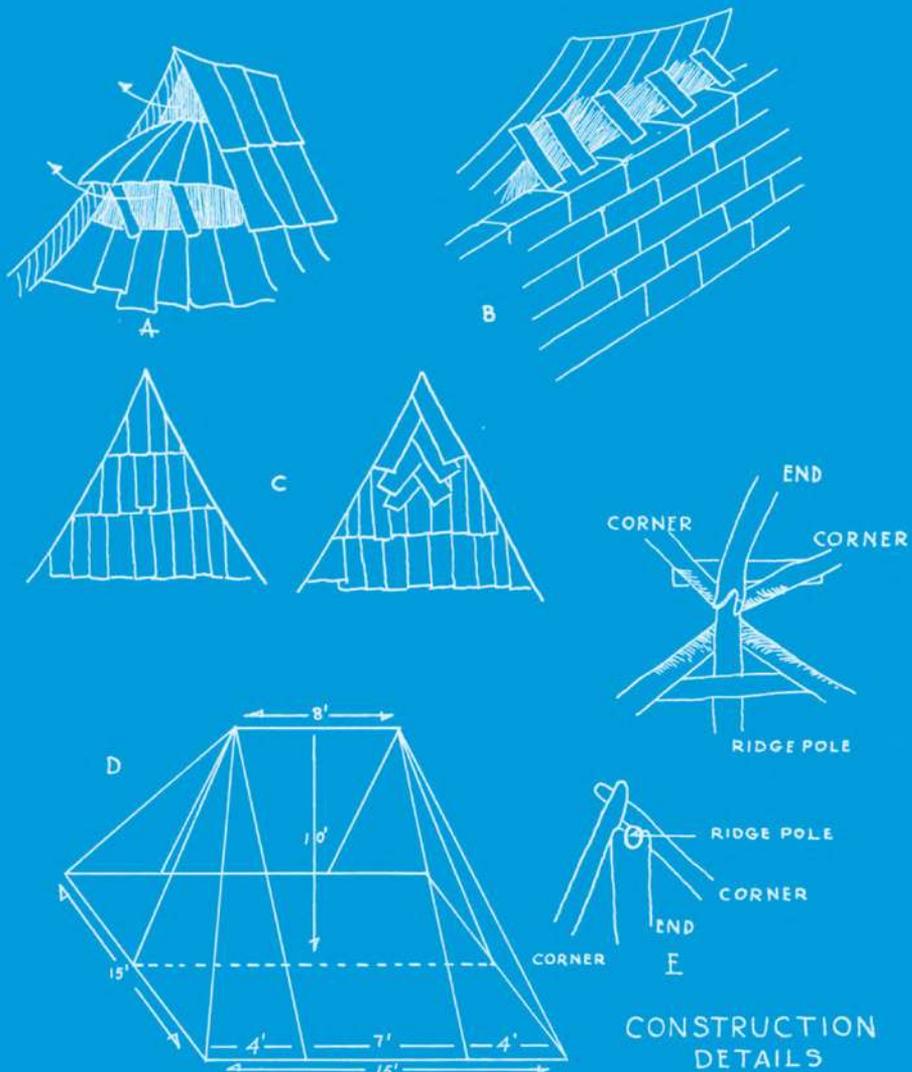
Details of roof construction. *a*, Vent in roof of kitchen; *b*, lean-to kitchen built against an adobe wall with ventilation arrangement; *c*, two ways of finishing shakes at apex of an end roof section; *d*, arrangement of rafters in a small Cherán house; *e*, joining of rafters and ridge pole viewed from outside roof frame; and (above) same seen from inside roof frame.
